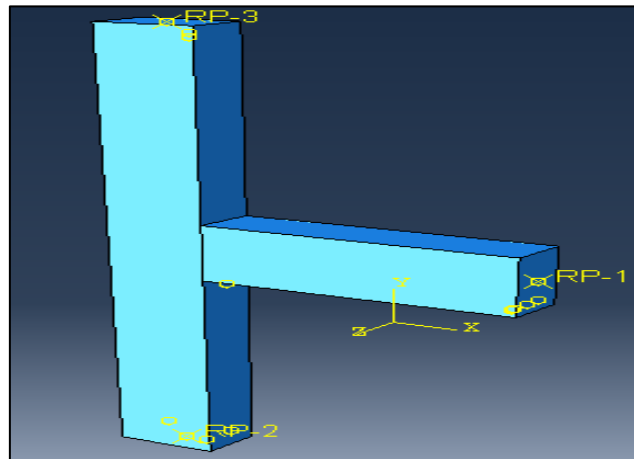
Model of the exterior beam column joint developed using Abaqus
